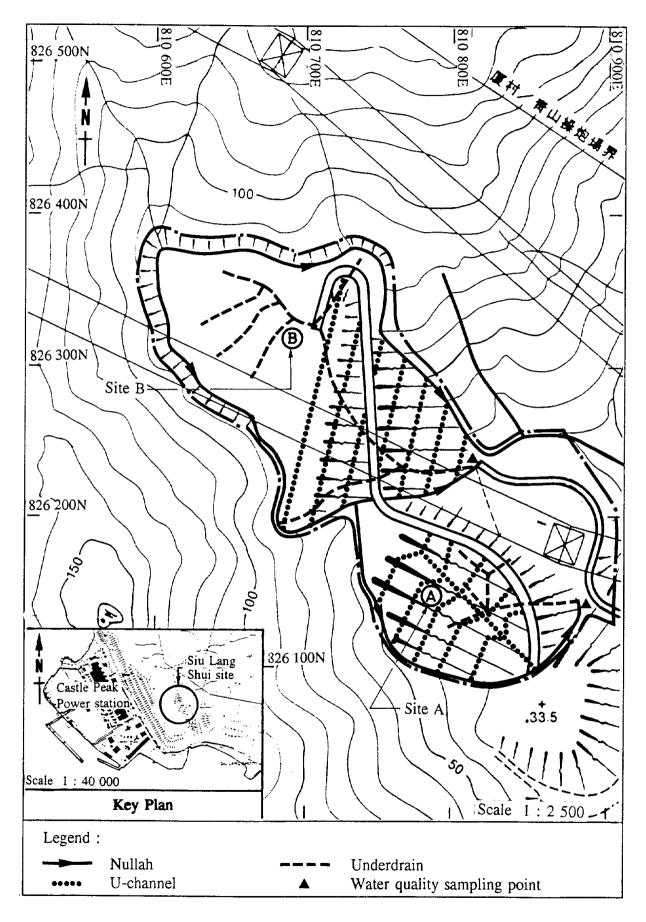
Layout of Underdrain at Siu Lang Shui Site
